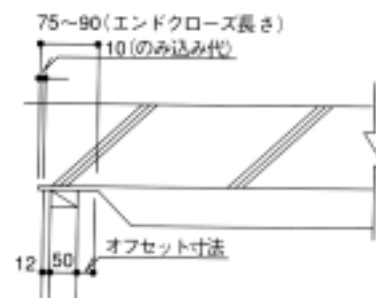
Details of end-closed of flat decks for reinforced concrete structures.
